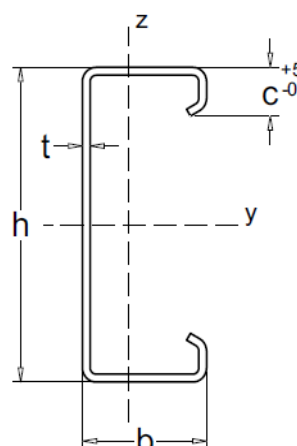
Cross-section scheme of the profiles of the supporting beams
